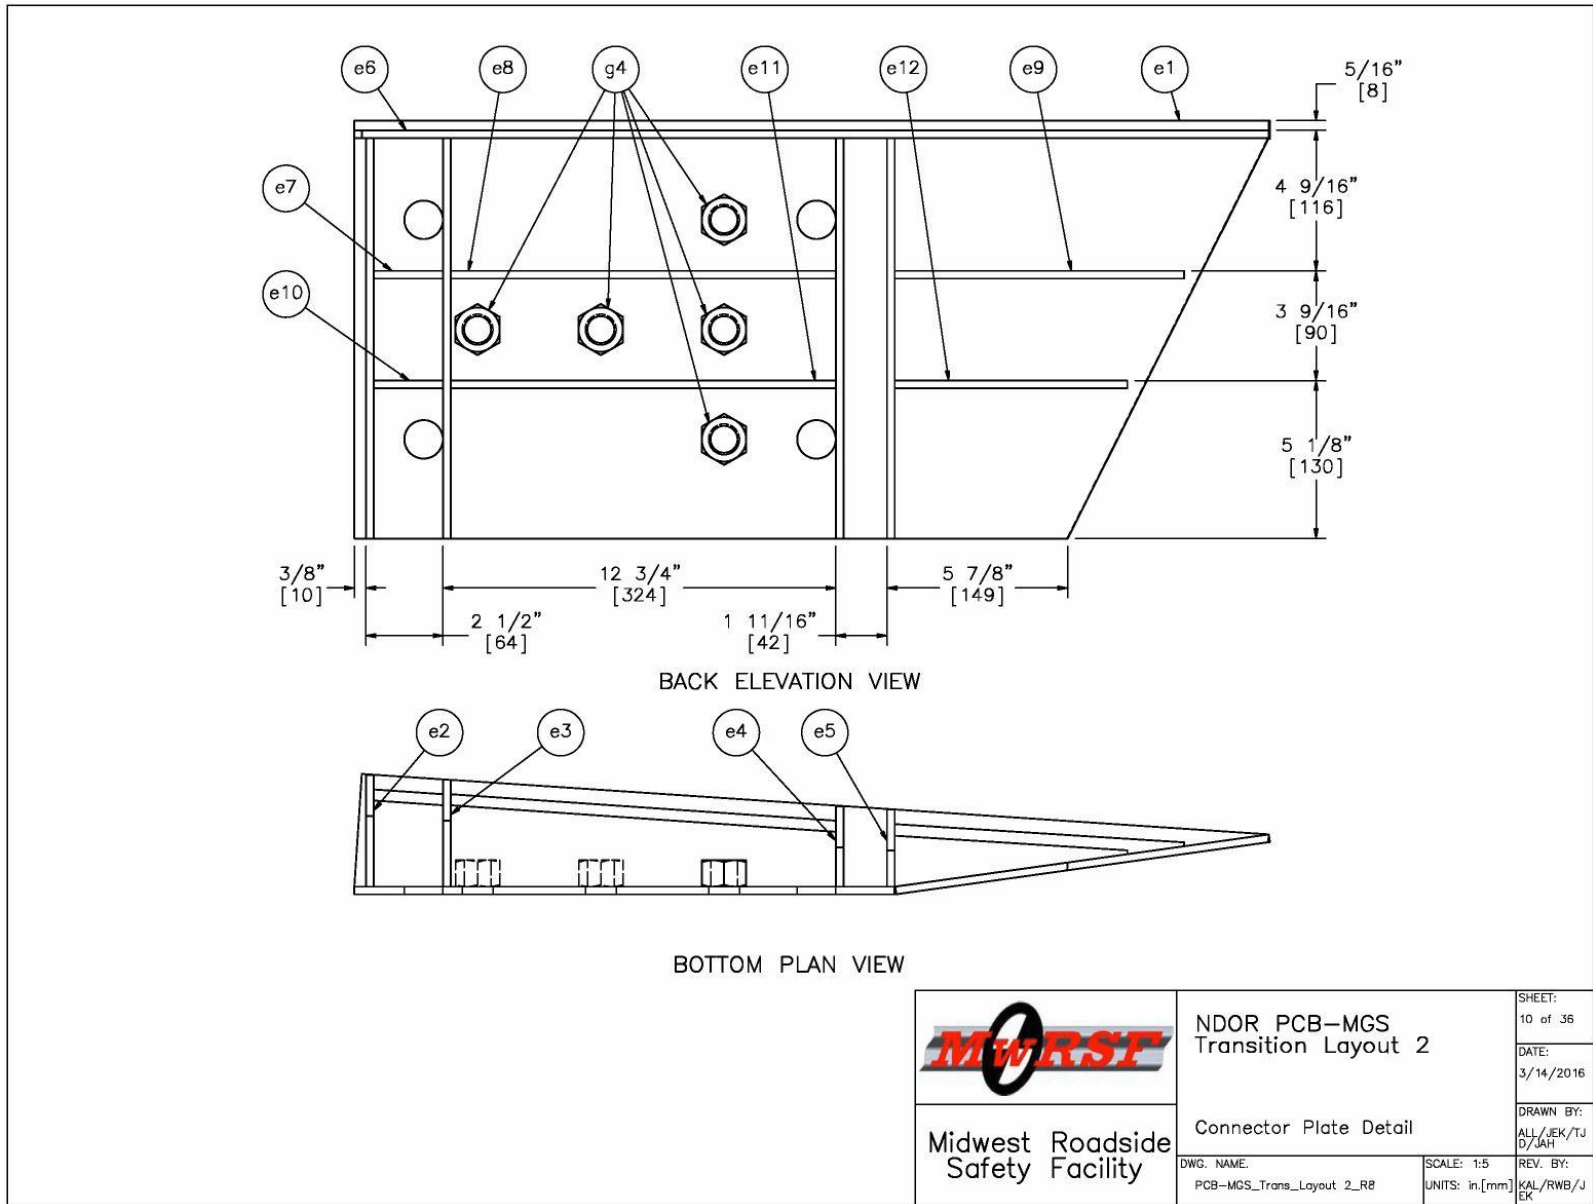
Connector Plate Detail, Test No. MGSPCB-1
